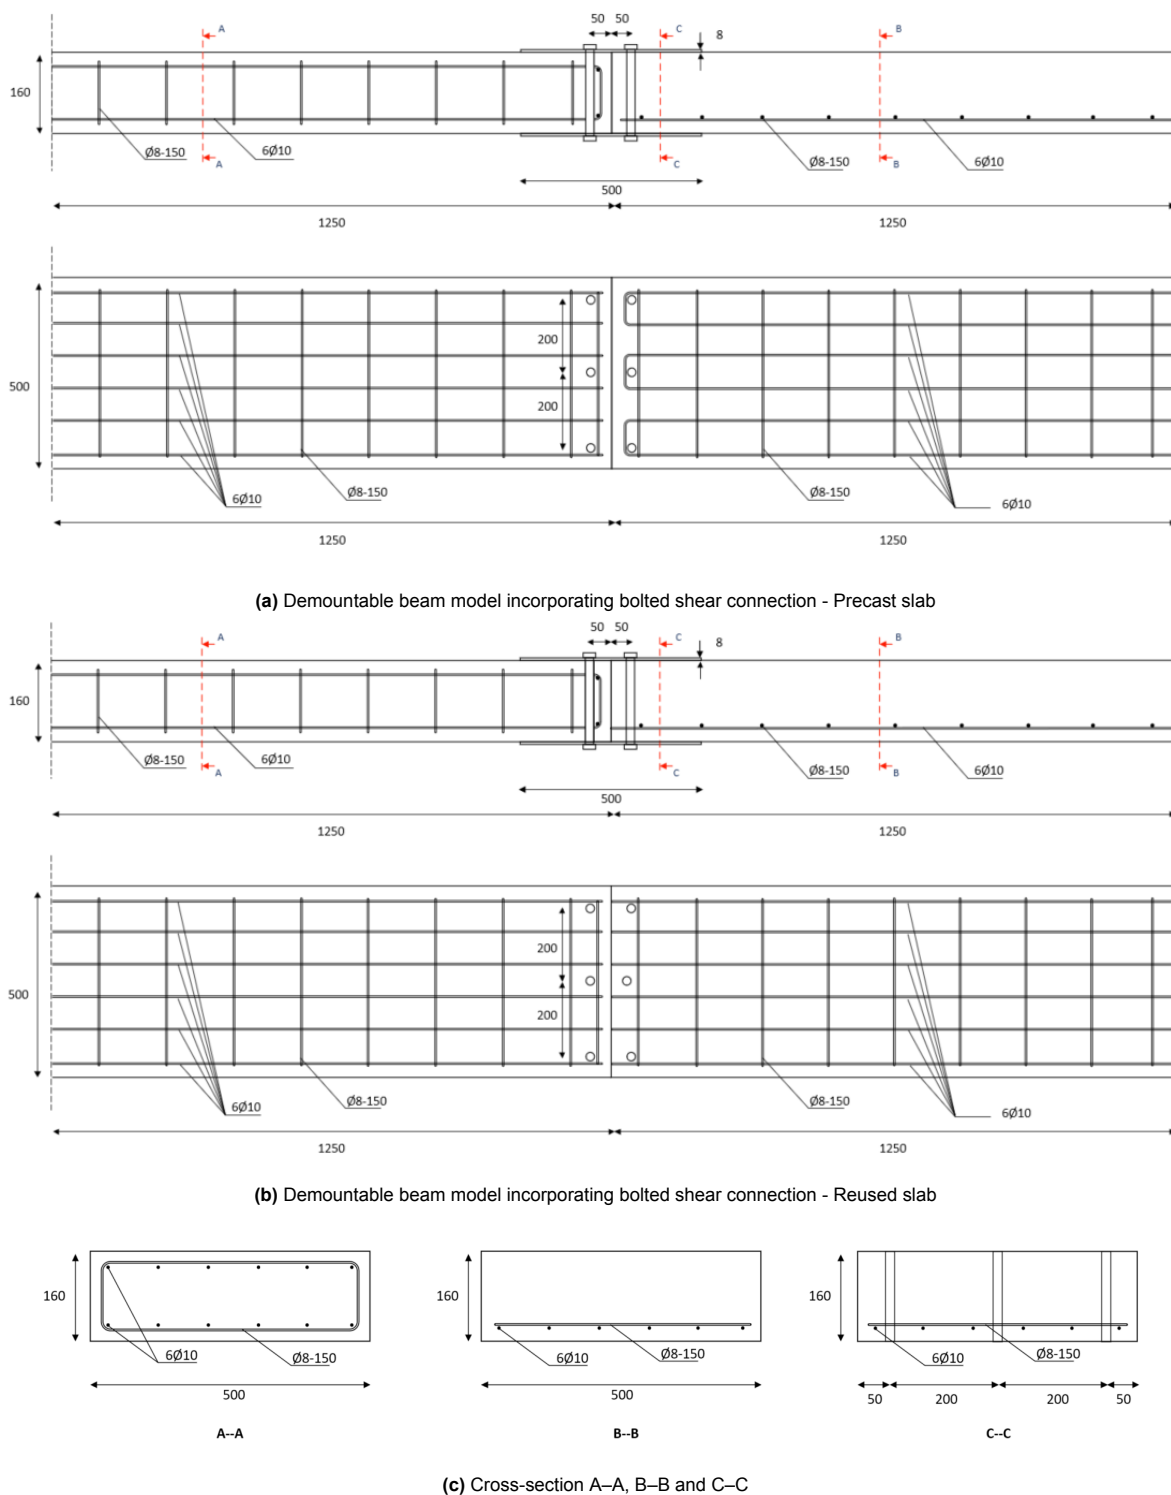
Geometry and reinforcement configuration for demountable beam models for 5 meter span - Half of the beam models presented only as symmetry conditions are applied (Measurement in mm)
